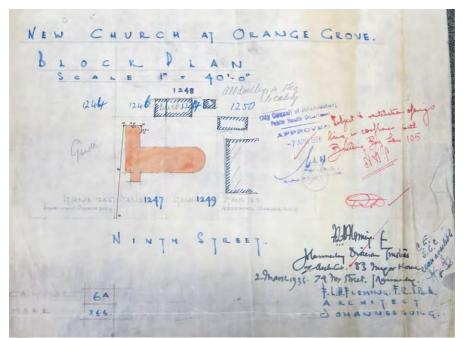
Plan for New Church at Orange Grove designed by F.L.H. Fleming in 1936 (Source: City Council of Johannesburg, Plans Archive)
